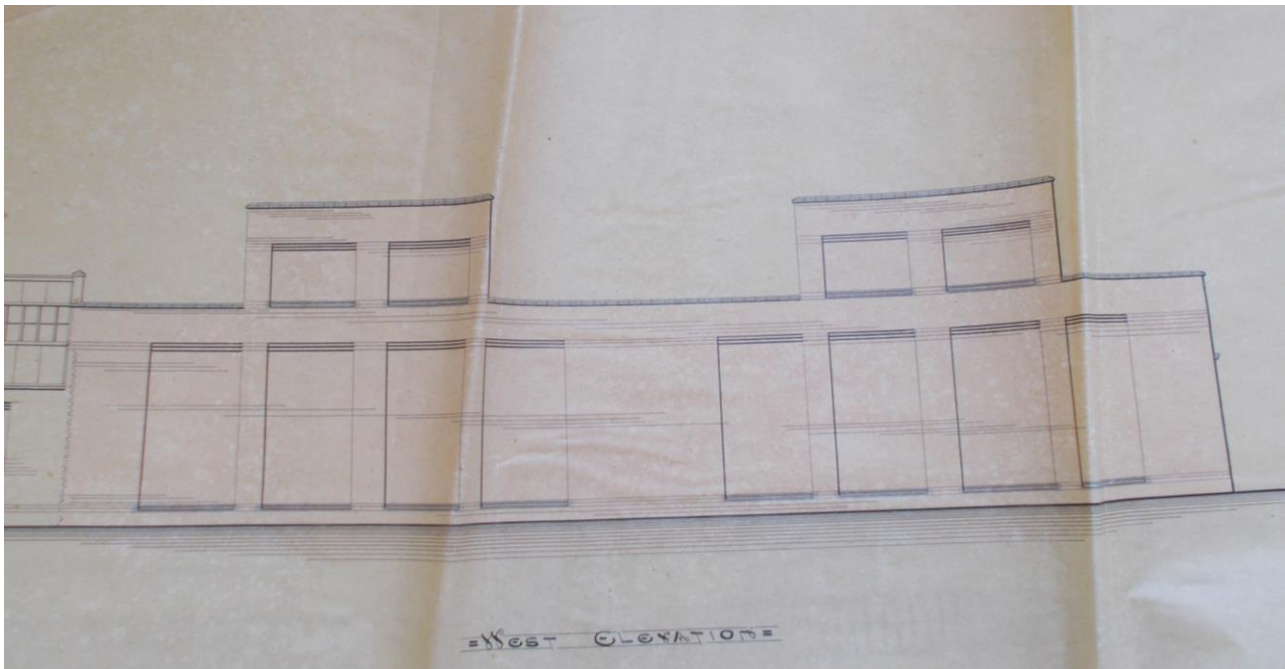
Original 1897 drawing showing proposed W elevation of Buildings 6 & 7
